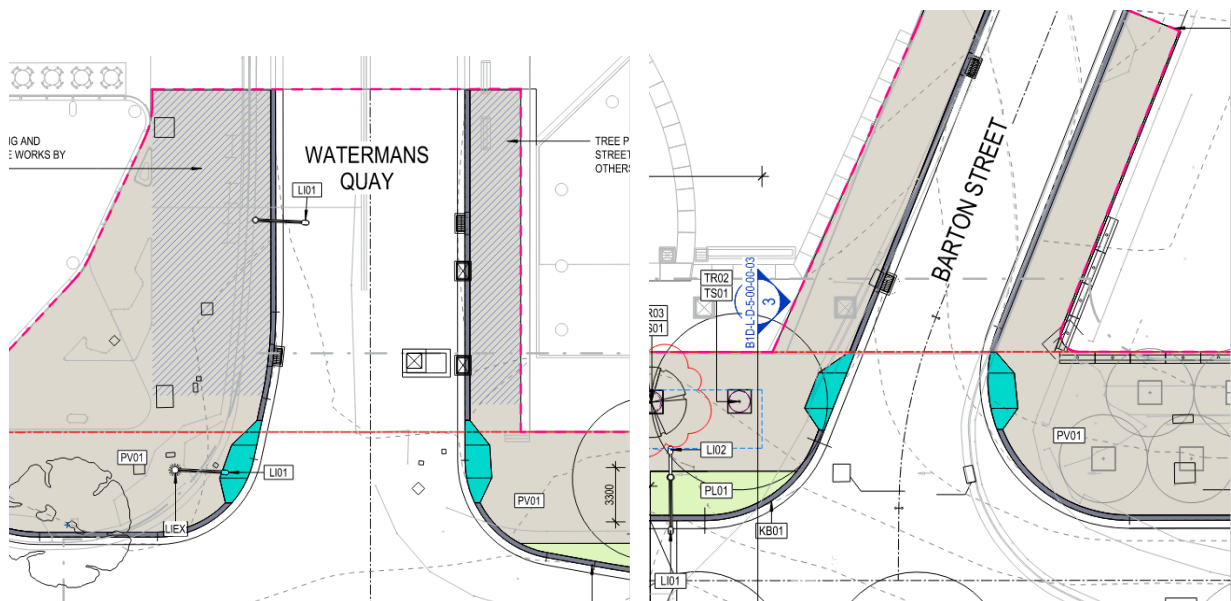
Plan of new kerb ramps across Waterman’s Quay and Barton Street, shown highlighted in blue
